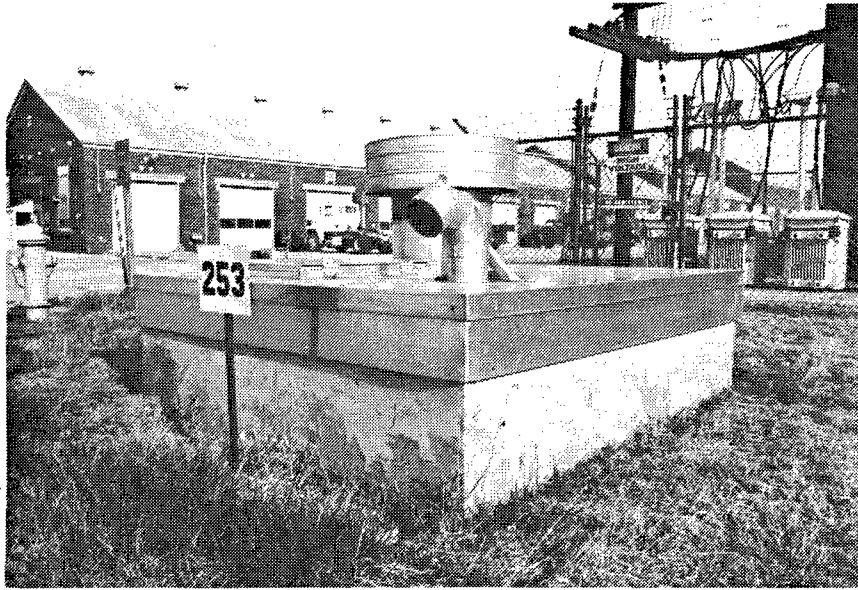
Building 253: Sewage Station where this covered pit serves as a Pump House.
